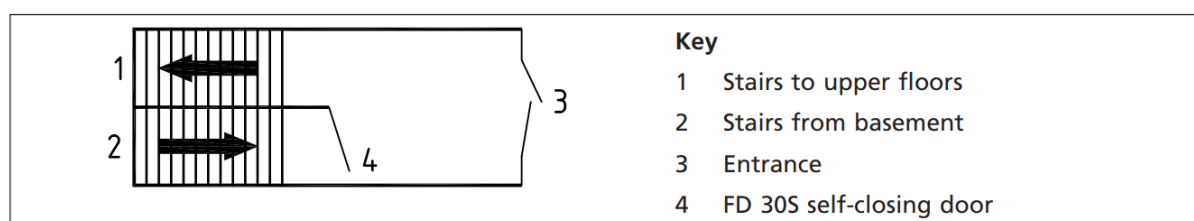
Staircase separating basement and upper storeys in small single stair residential buildings
